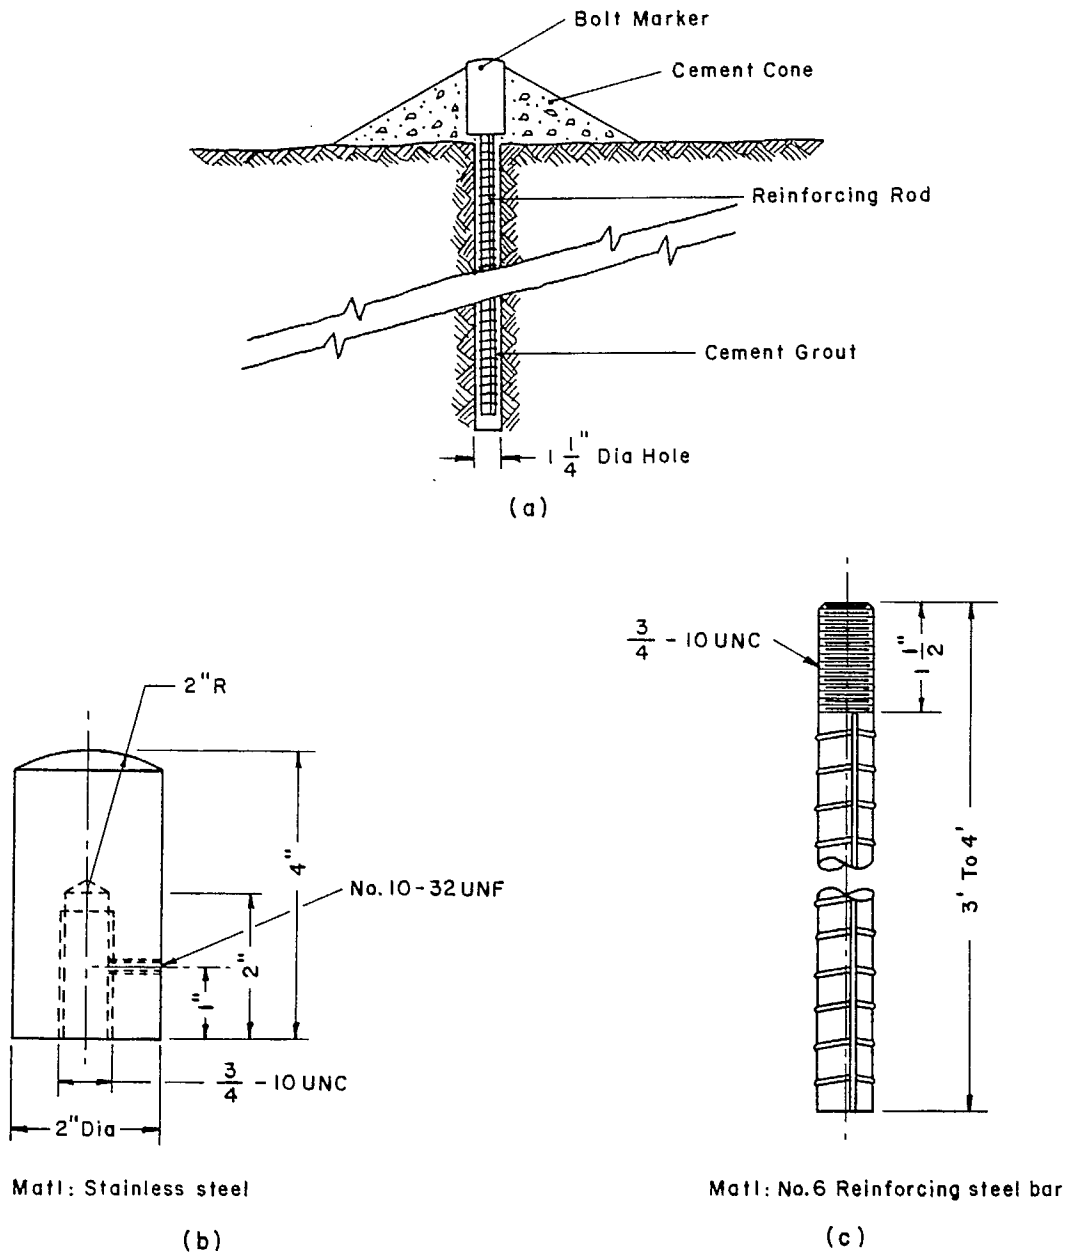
Diagrams of level station: (a) cross section of level station, (b) bolt marker, and (c) rock anchor.
